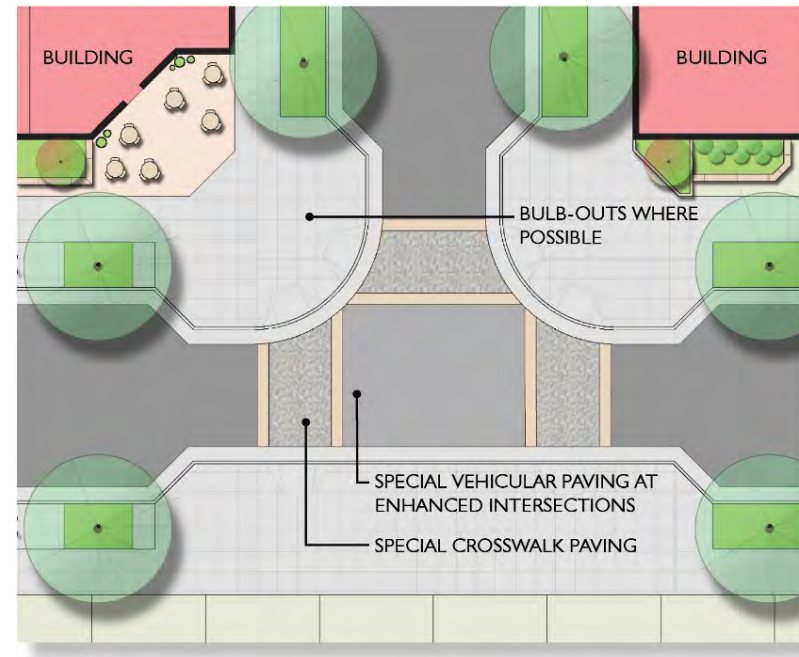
Bulb-Outs and Sidewalk Scoring Pattern
